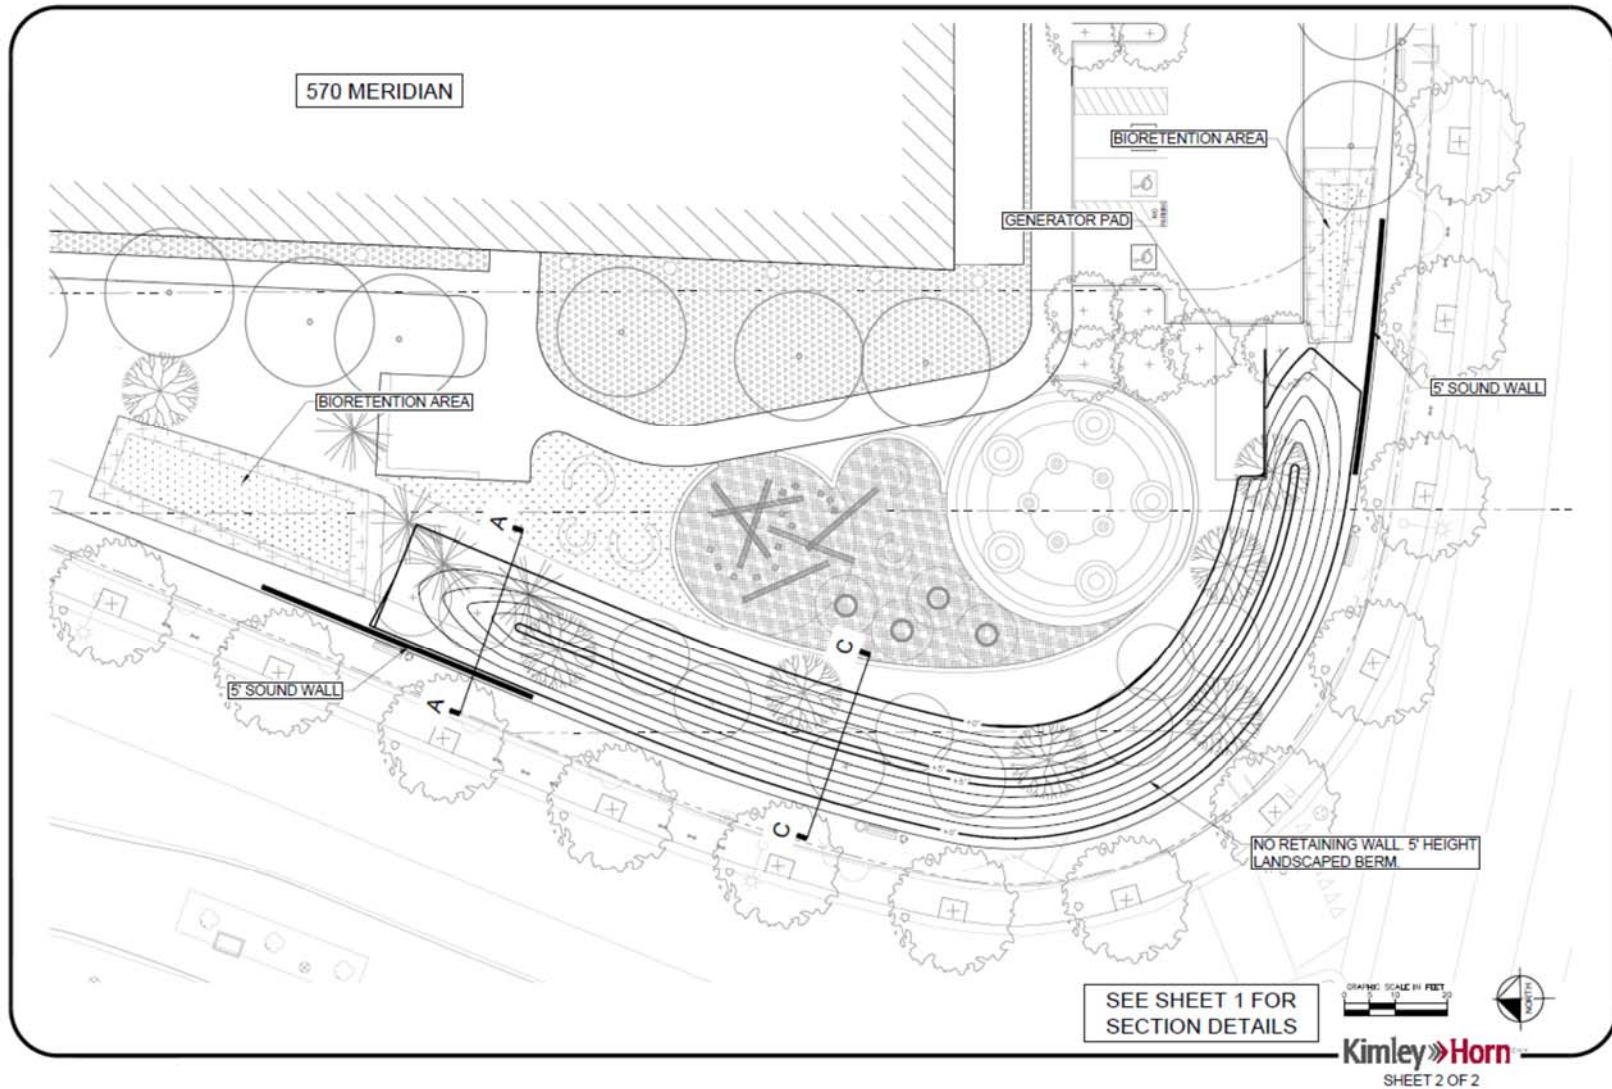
Proposed Location of 5-foot Noise Barrier at Building 2 Playground
